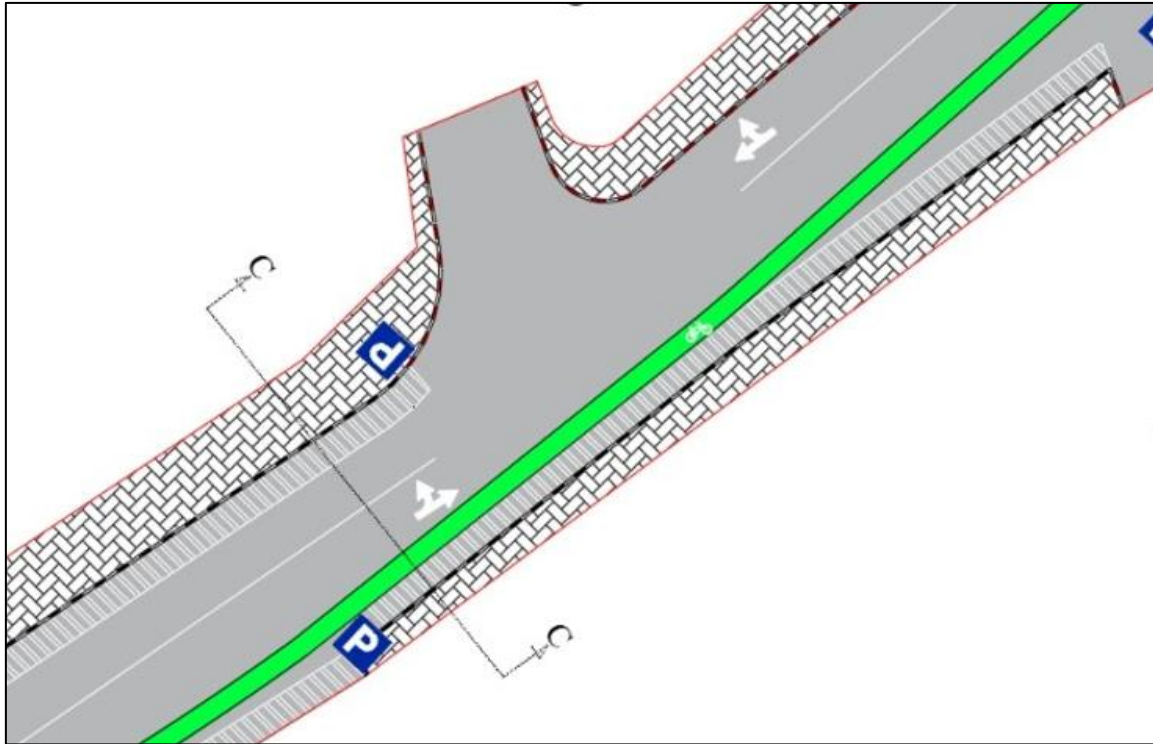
10: Plan Drawing, Section C-C, Rafidia Street
